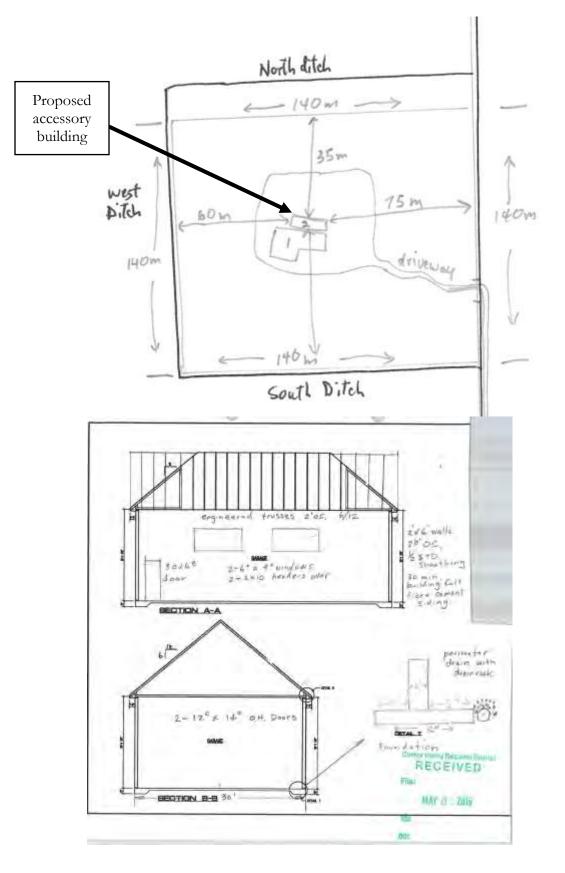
Site Plan and Building Drawing, as submitted by Applicants
